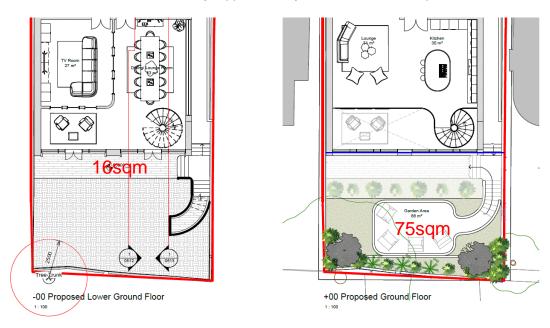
Proposed Ground Floor Plan - Amenity Areas
